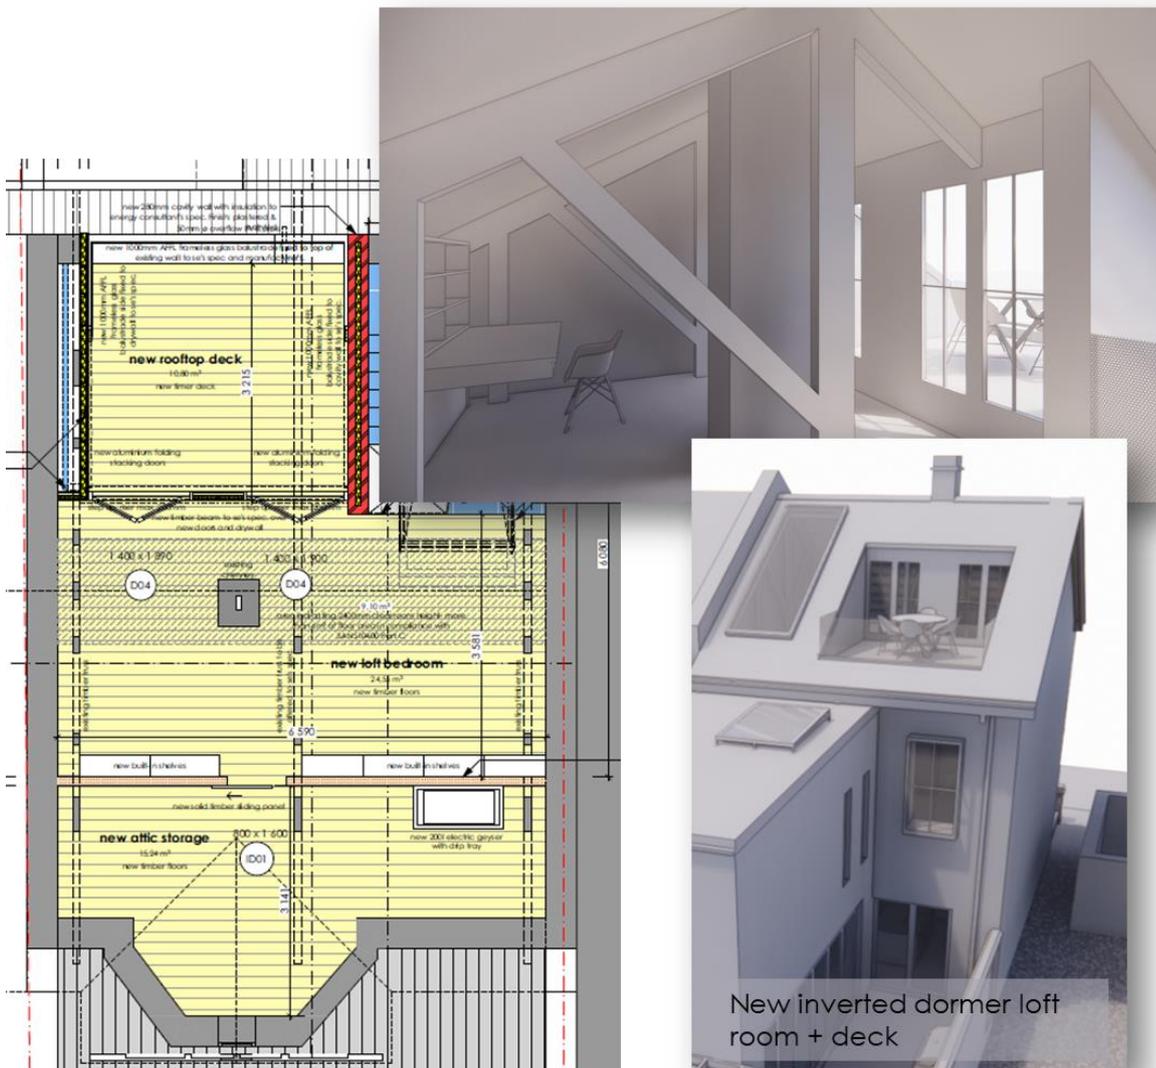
Proposed work: new loft bedroom space within the existing roof space
